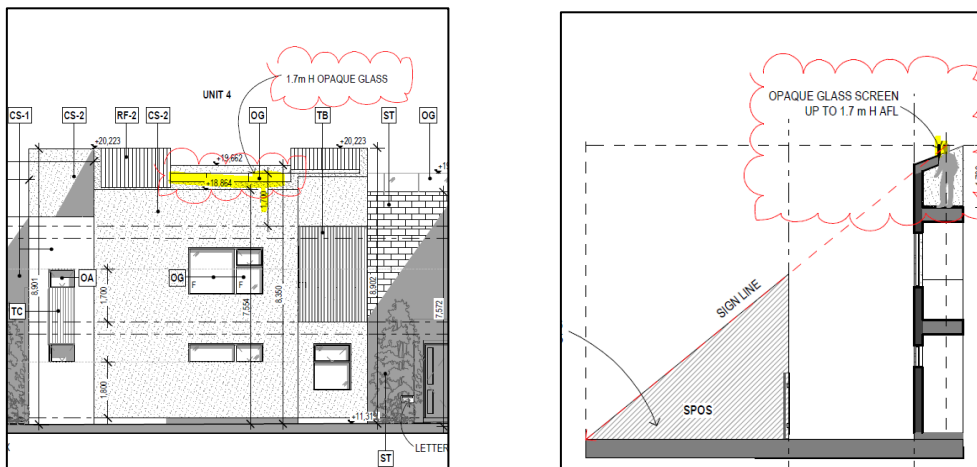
Northern elevation and section showing proposed additional screening as per sketch plans dated 02.03.2020
